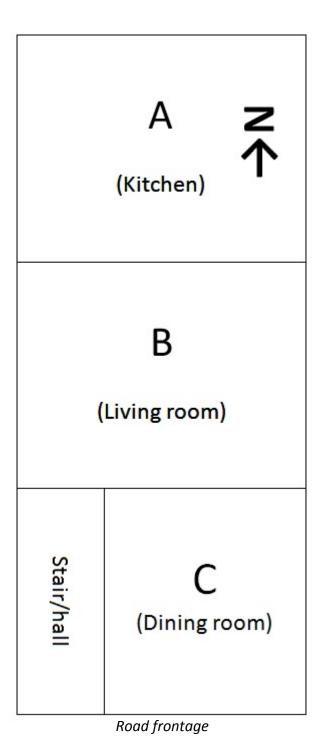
Simple plan to show layout and arrangements of the units to Home Farm Cottage as determined by the building survey team. It is possible that these units correspond to various phases or alterations of the building (after building survey team)
